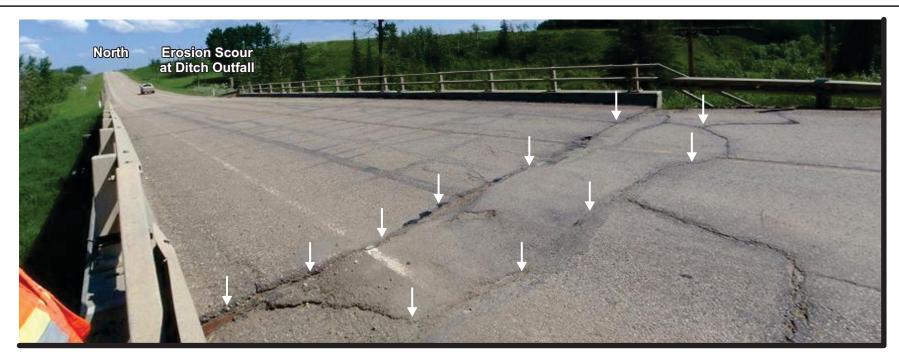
Photo III Looking north at south approach slab area at south headslope abutment • Cracking and minor sag at south approach to bridge deck
